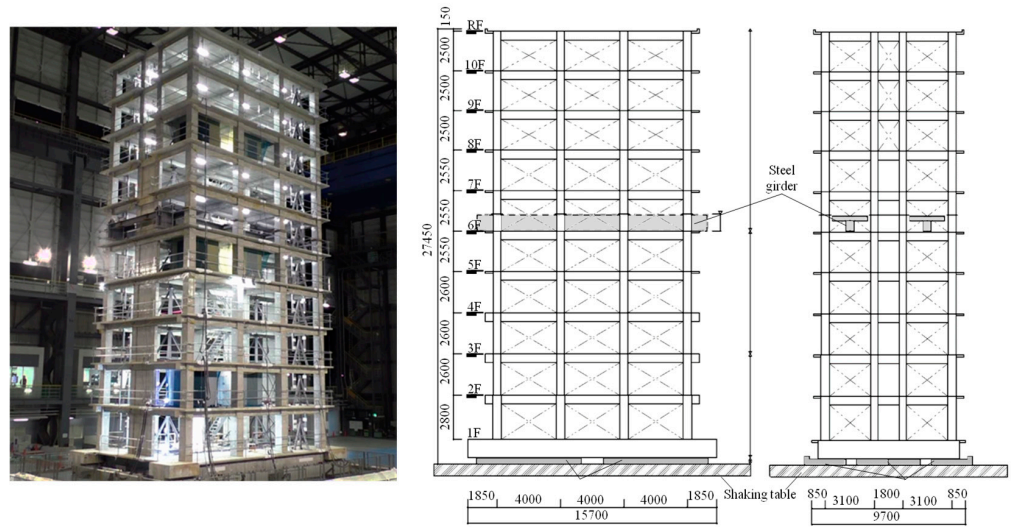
The photograph and schematic of the full-scale specimen on the shaking table.
